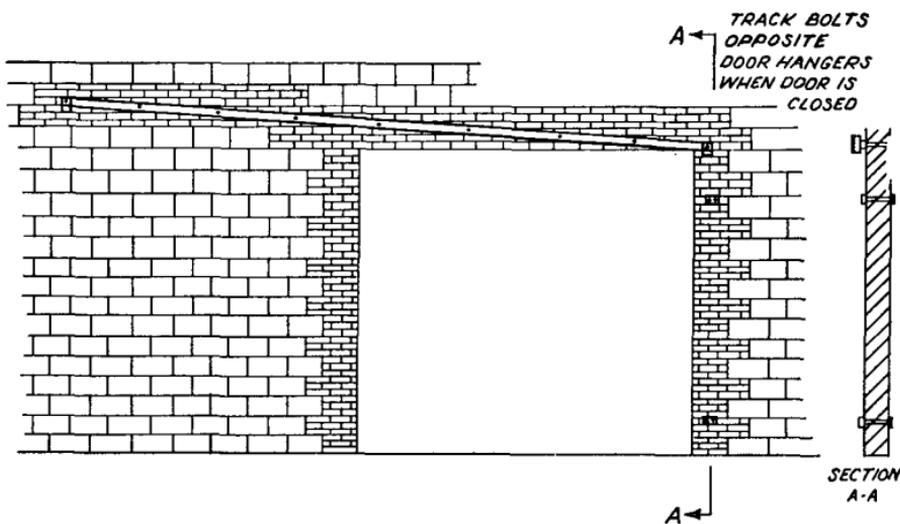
Concrete block wall prepared for a single tin-clad or sheet metal slide door, standard method.
